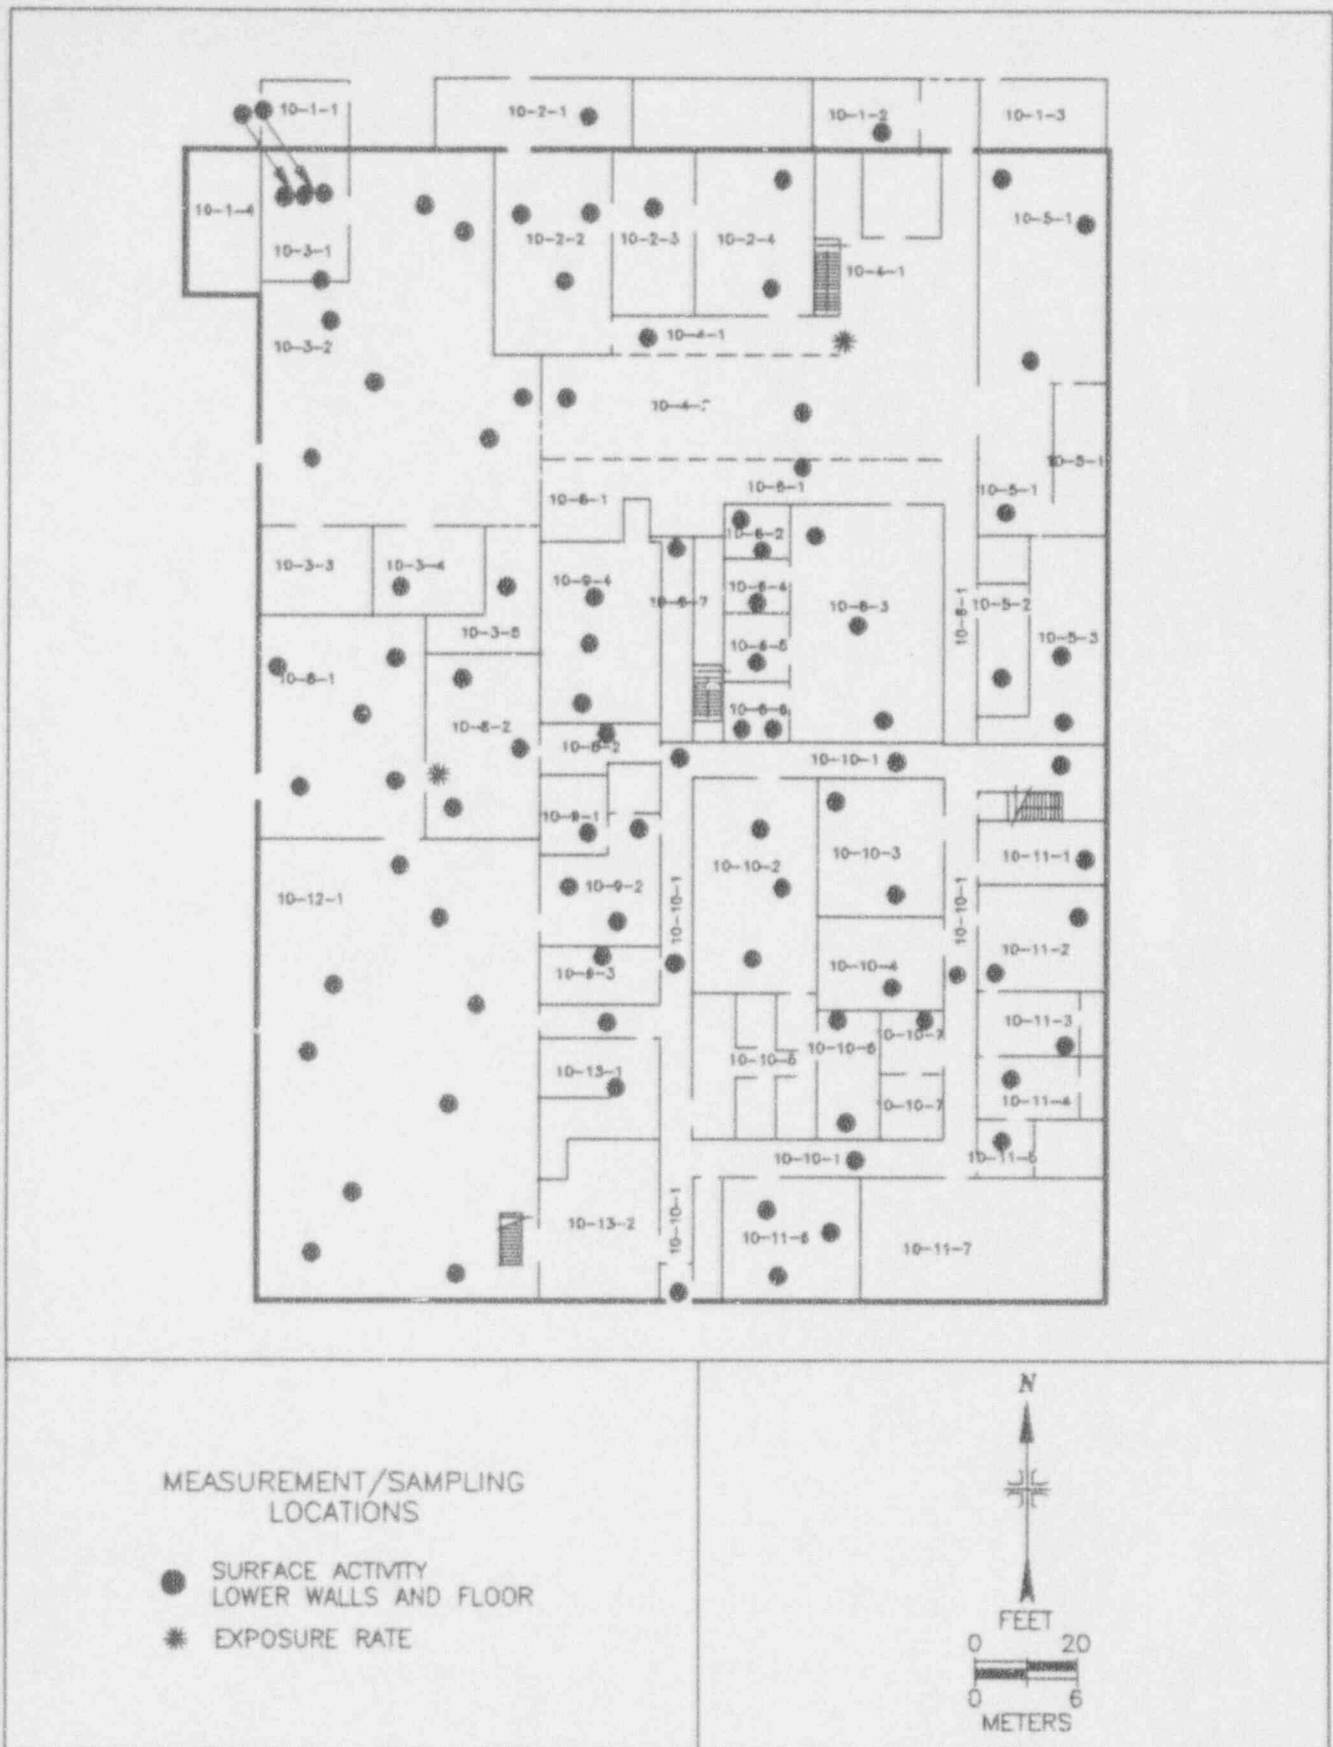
Building 9, First Floor – Measurement and Sampling Locations
